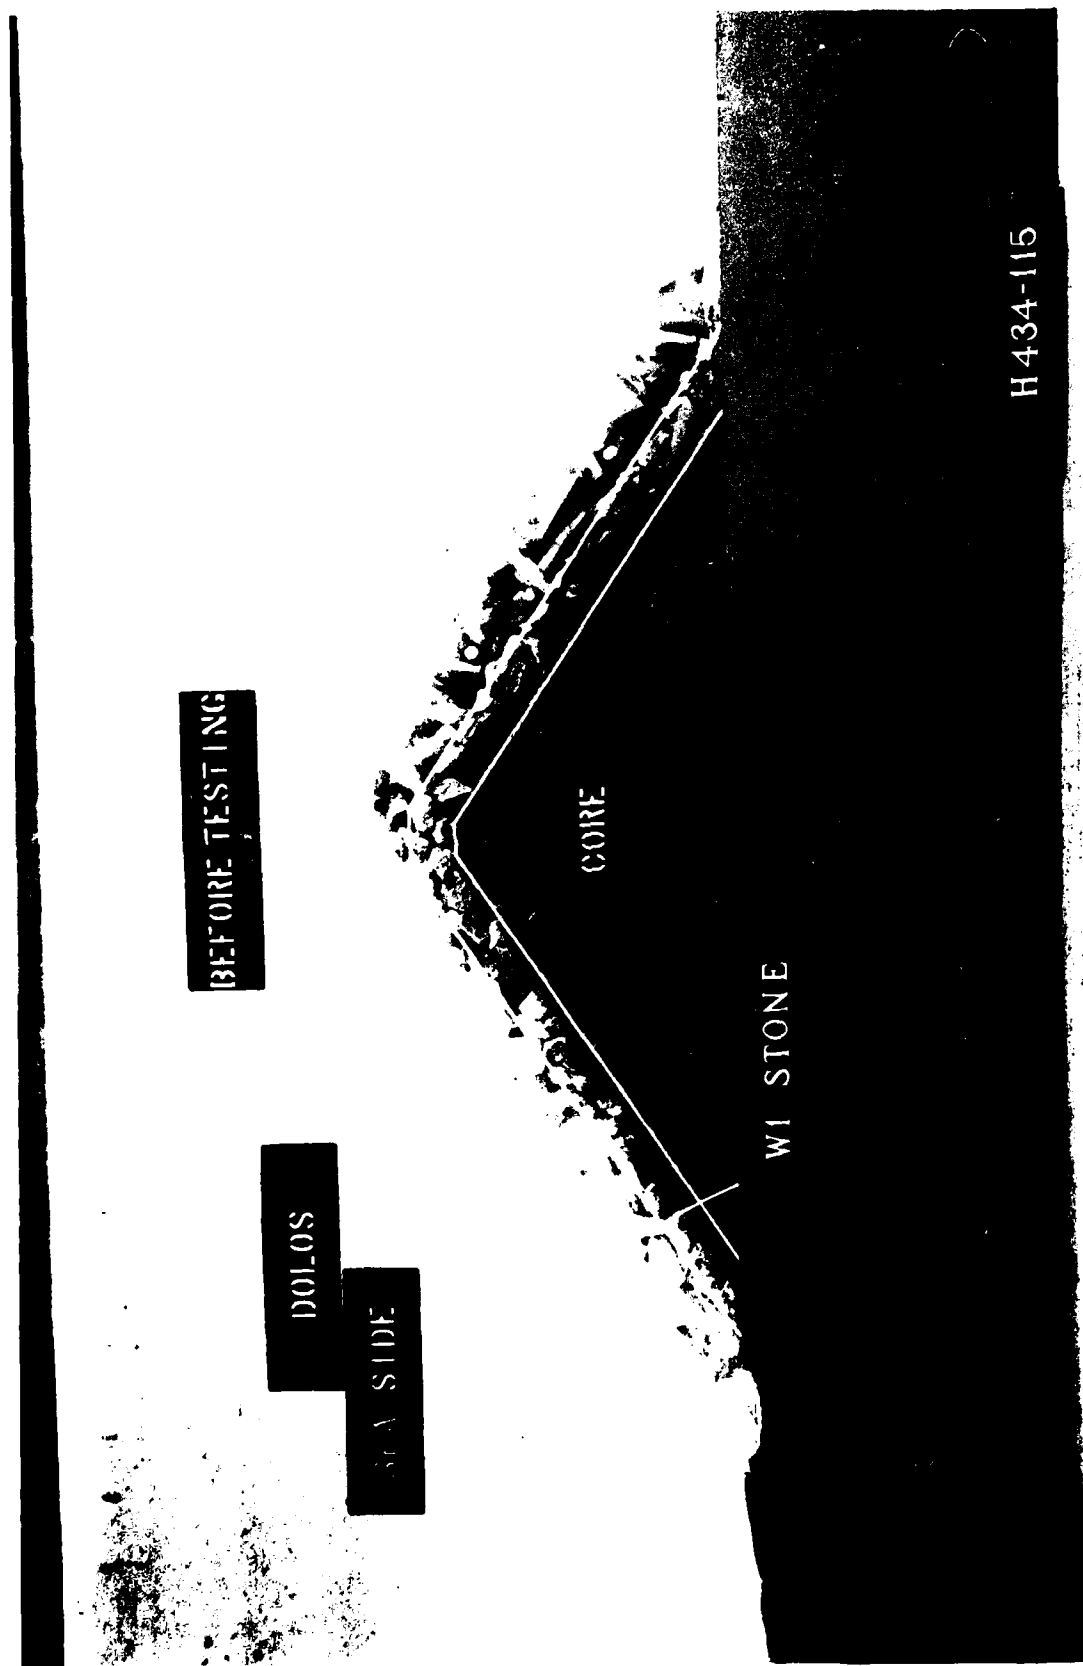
End view of a typical dolos section before wave attack at a 1V-on-1.5H sea-side structure slope;  $W_a = 0.276 \text{ lb}$
